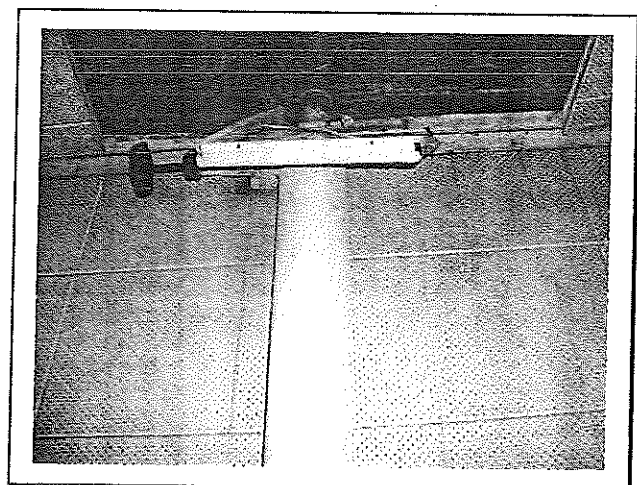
Viewing 4" pipe insulation, 3 rd floor.
